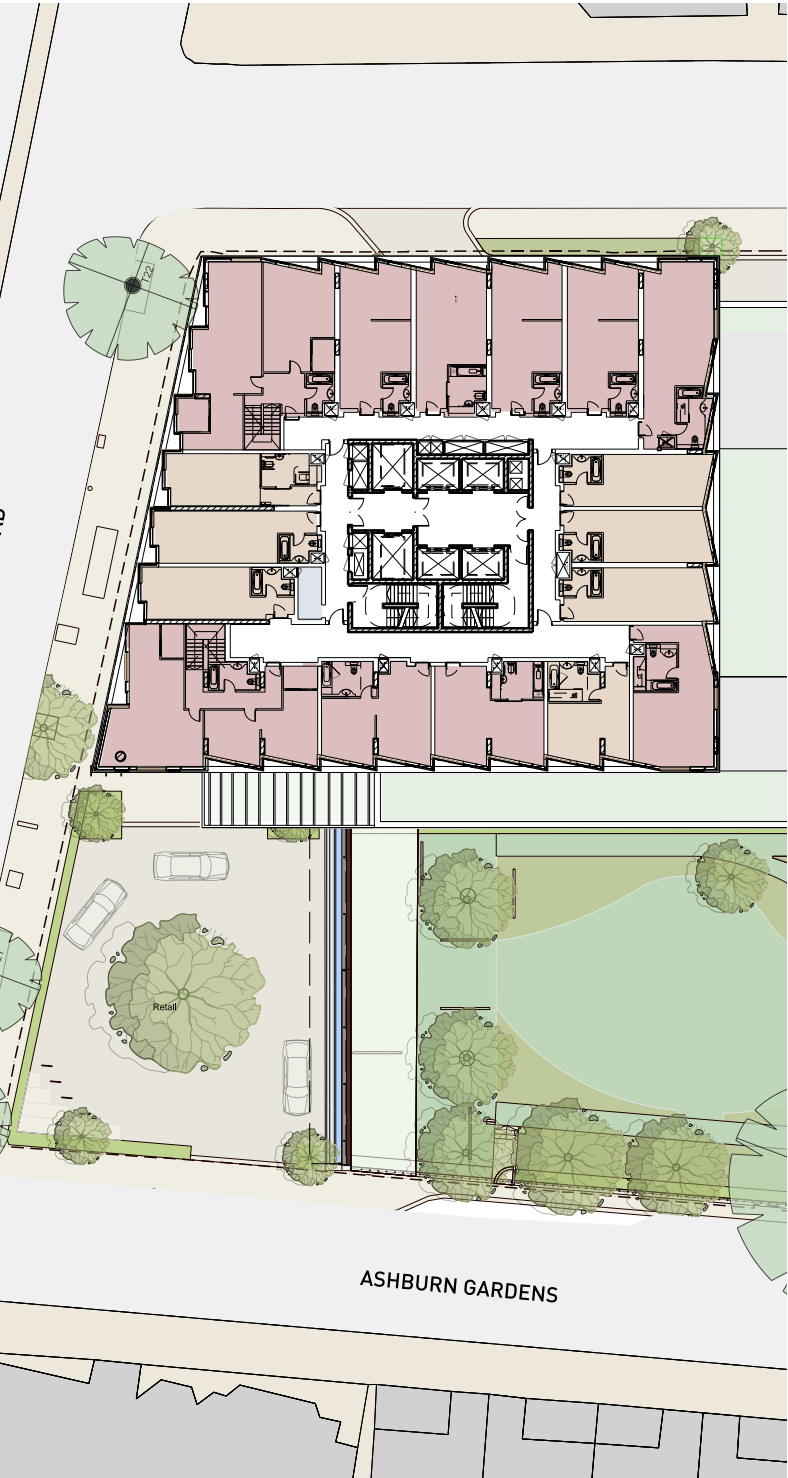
Twenty-eighth floor plan of the hotel tower
